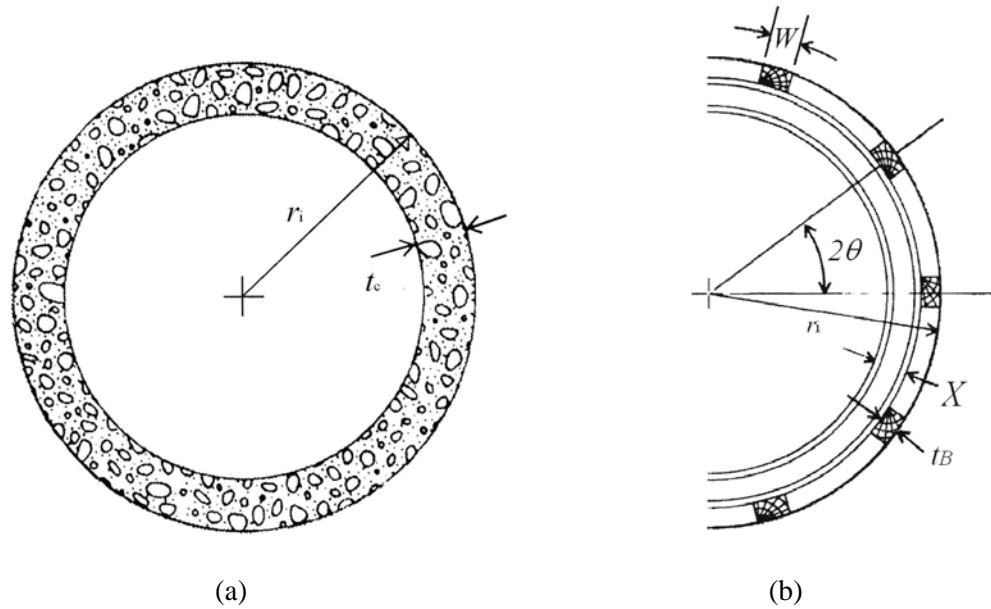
Support Systems: (a) Concrete / Shotcrete Lining, (b) Blocked Steel Set
